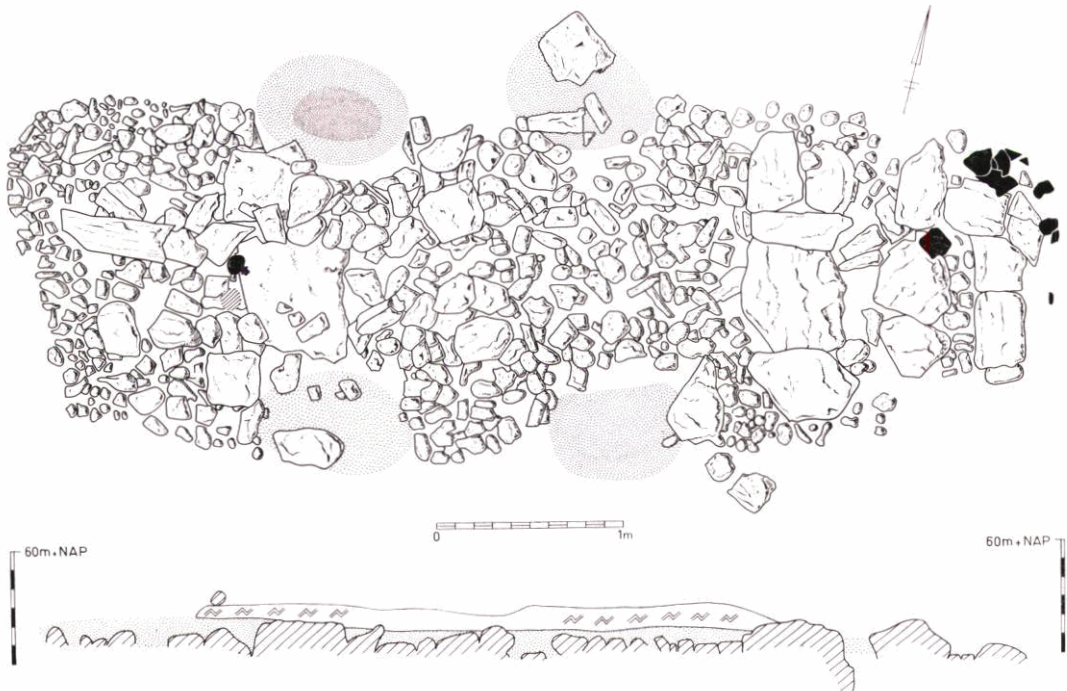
Floor plan and cross-section of the stone floor. Scale 1 : 40.
